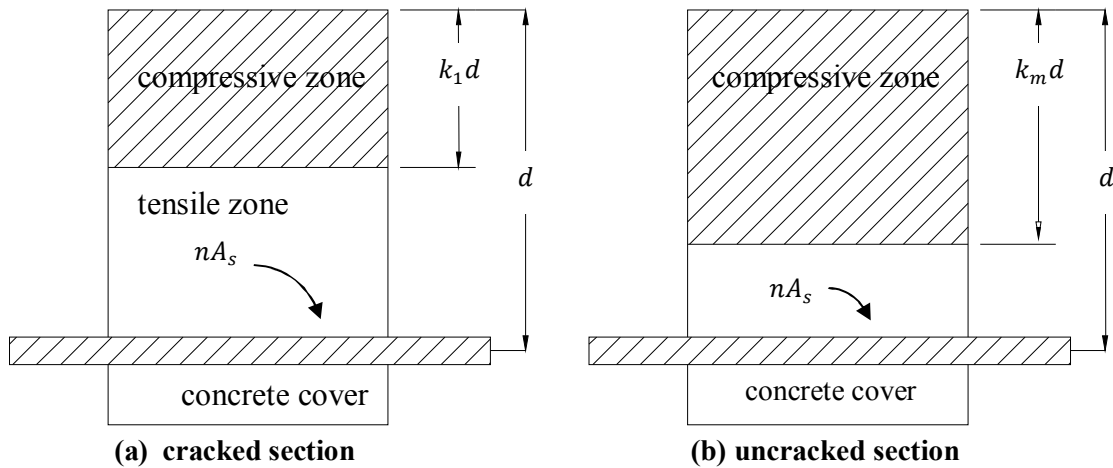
The cross sectional area of the steel transformed to the concrete area at (a) the cracked section (see Figure 6-1 (a)) and (b) uncracked section (see Figure 6-1 (c)).
